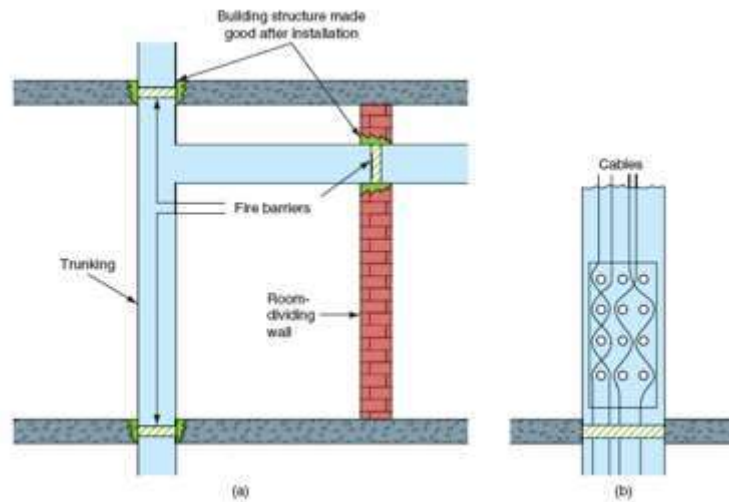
Installation of trunking (a) fire barriers in trunking (b) cable support in vertical trunking
